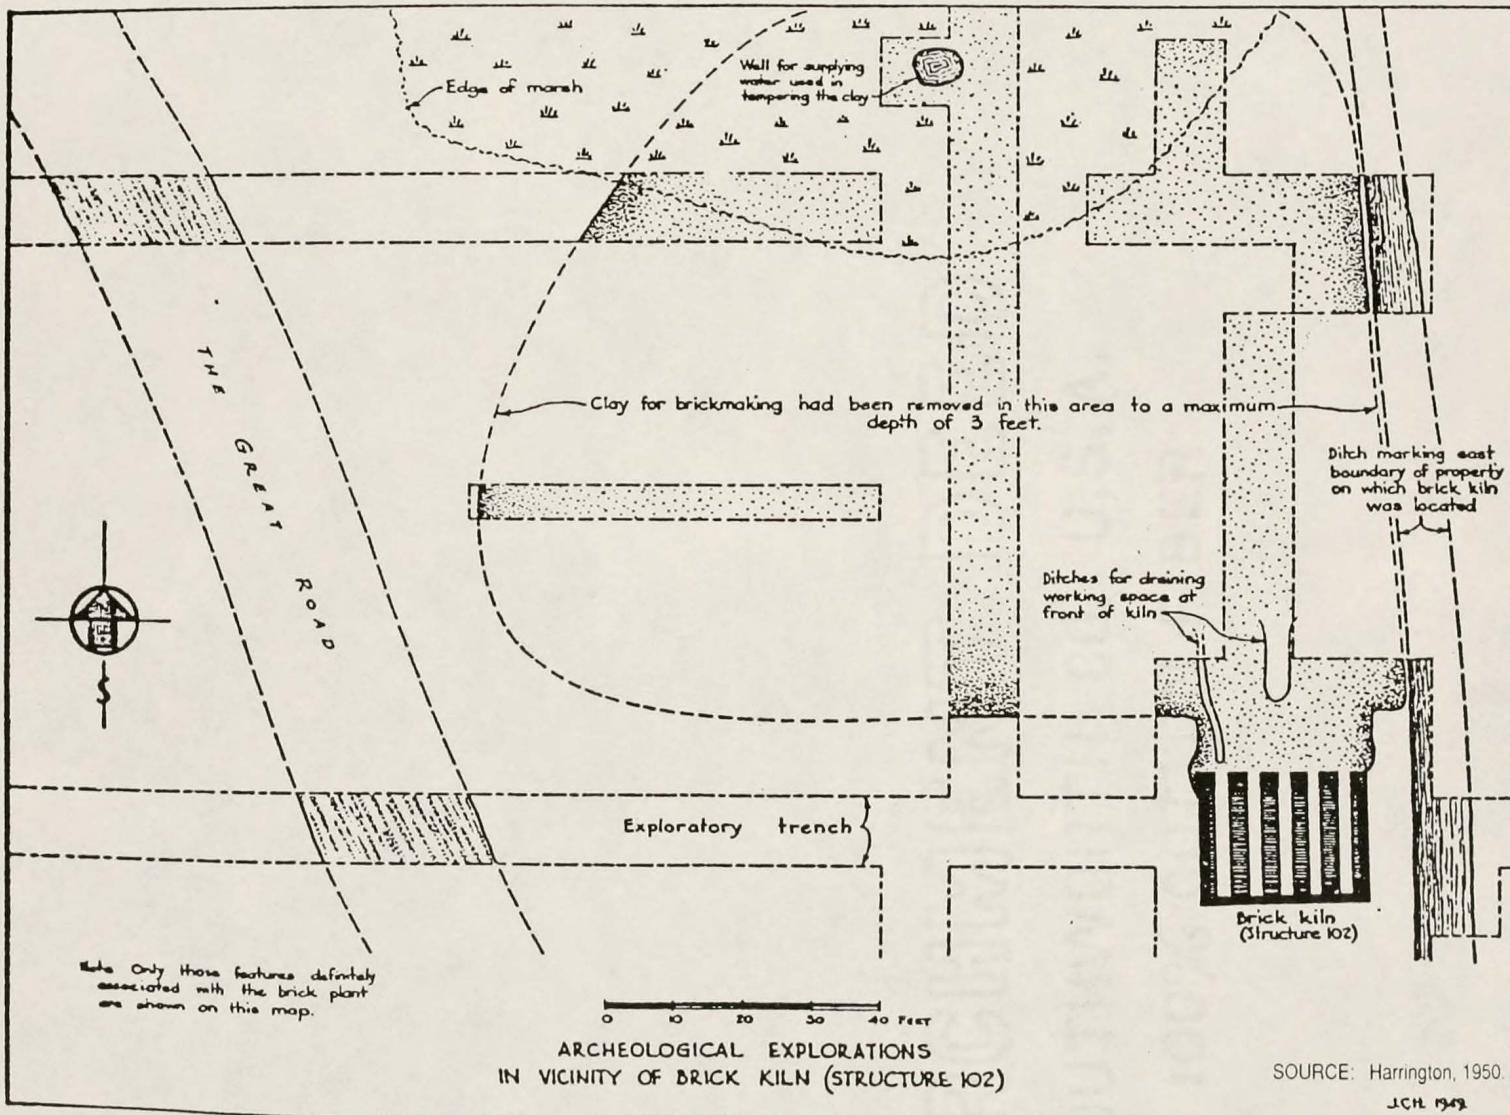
Site Plan, Jamestown, Virginia Brickyard
